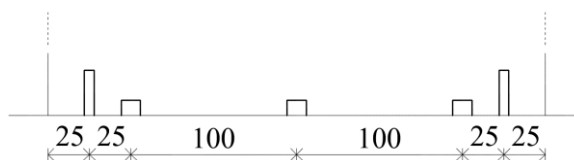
Arrangement of the connection of the designed wall (measures in cm).
